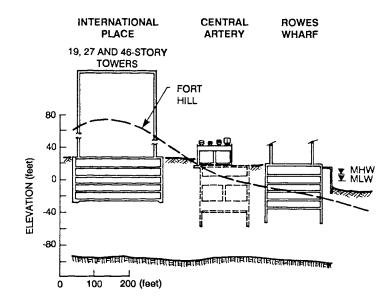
Schematic Cross-Section in Downtown Boston, Massachusetts
